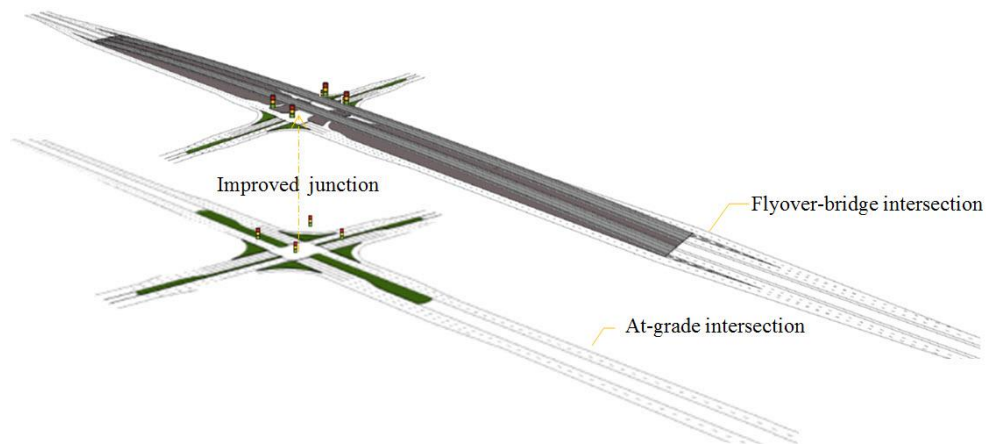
The layout of an at-grade intersection converted to a flyover-bridge intersection.
